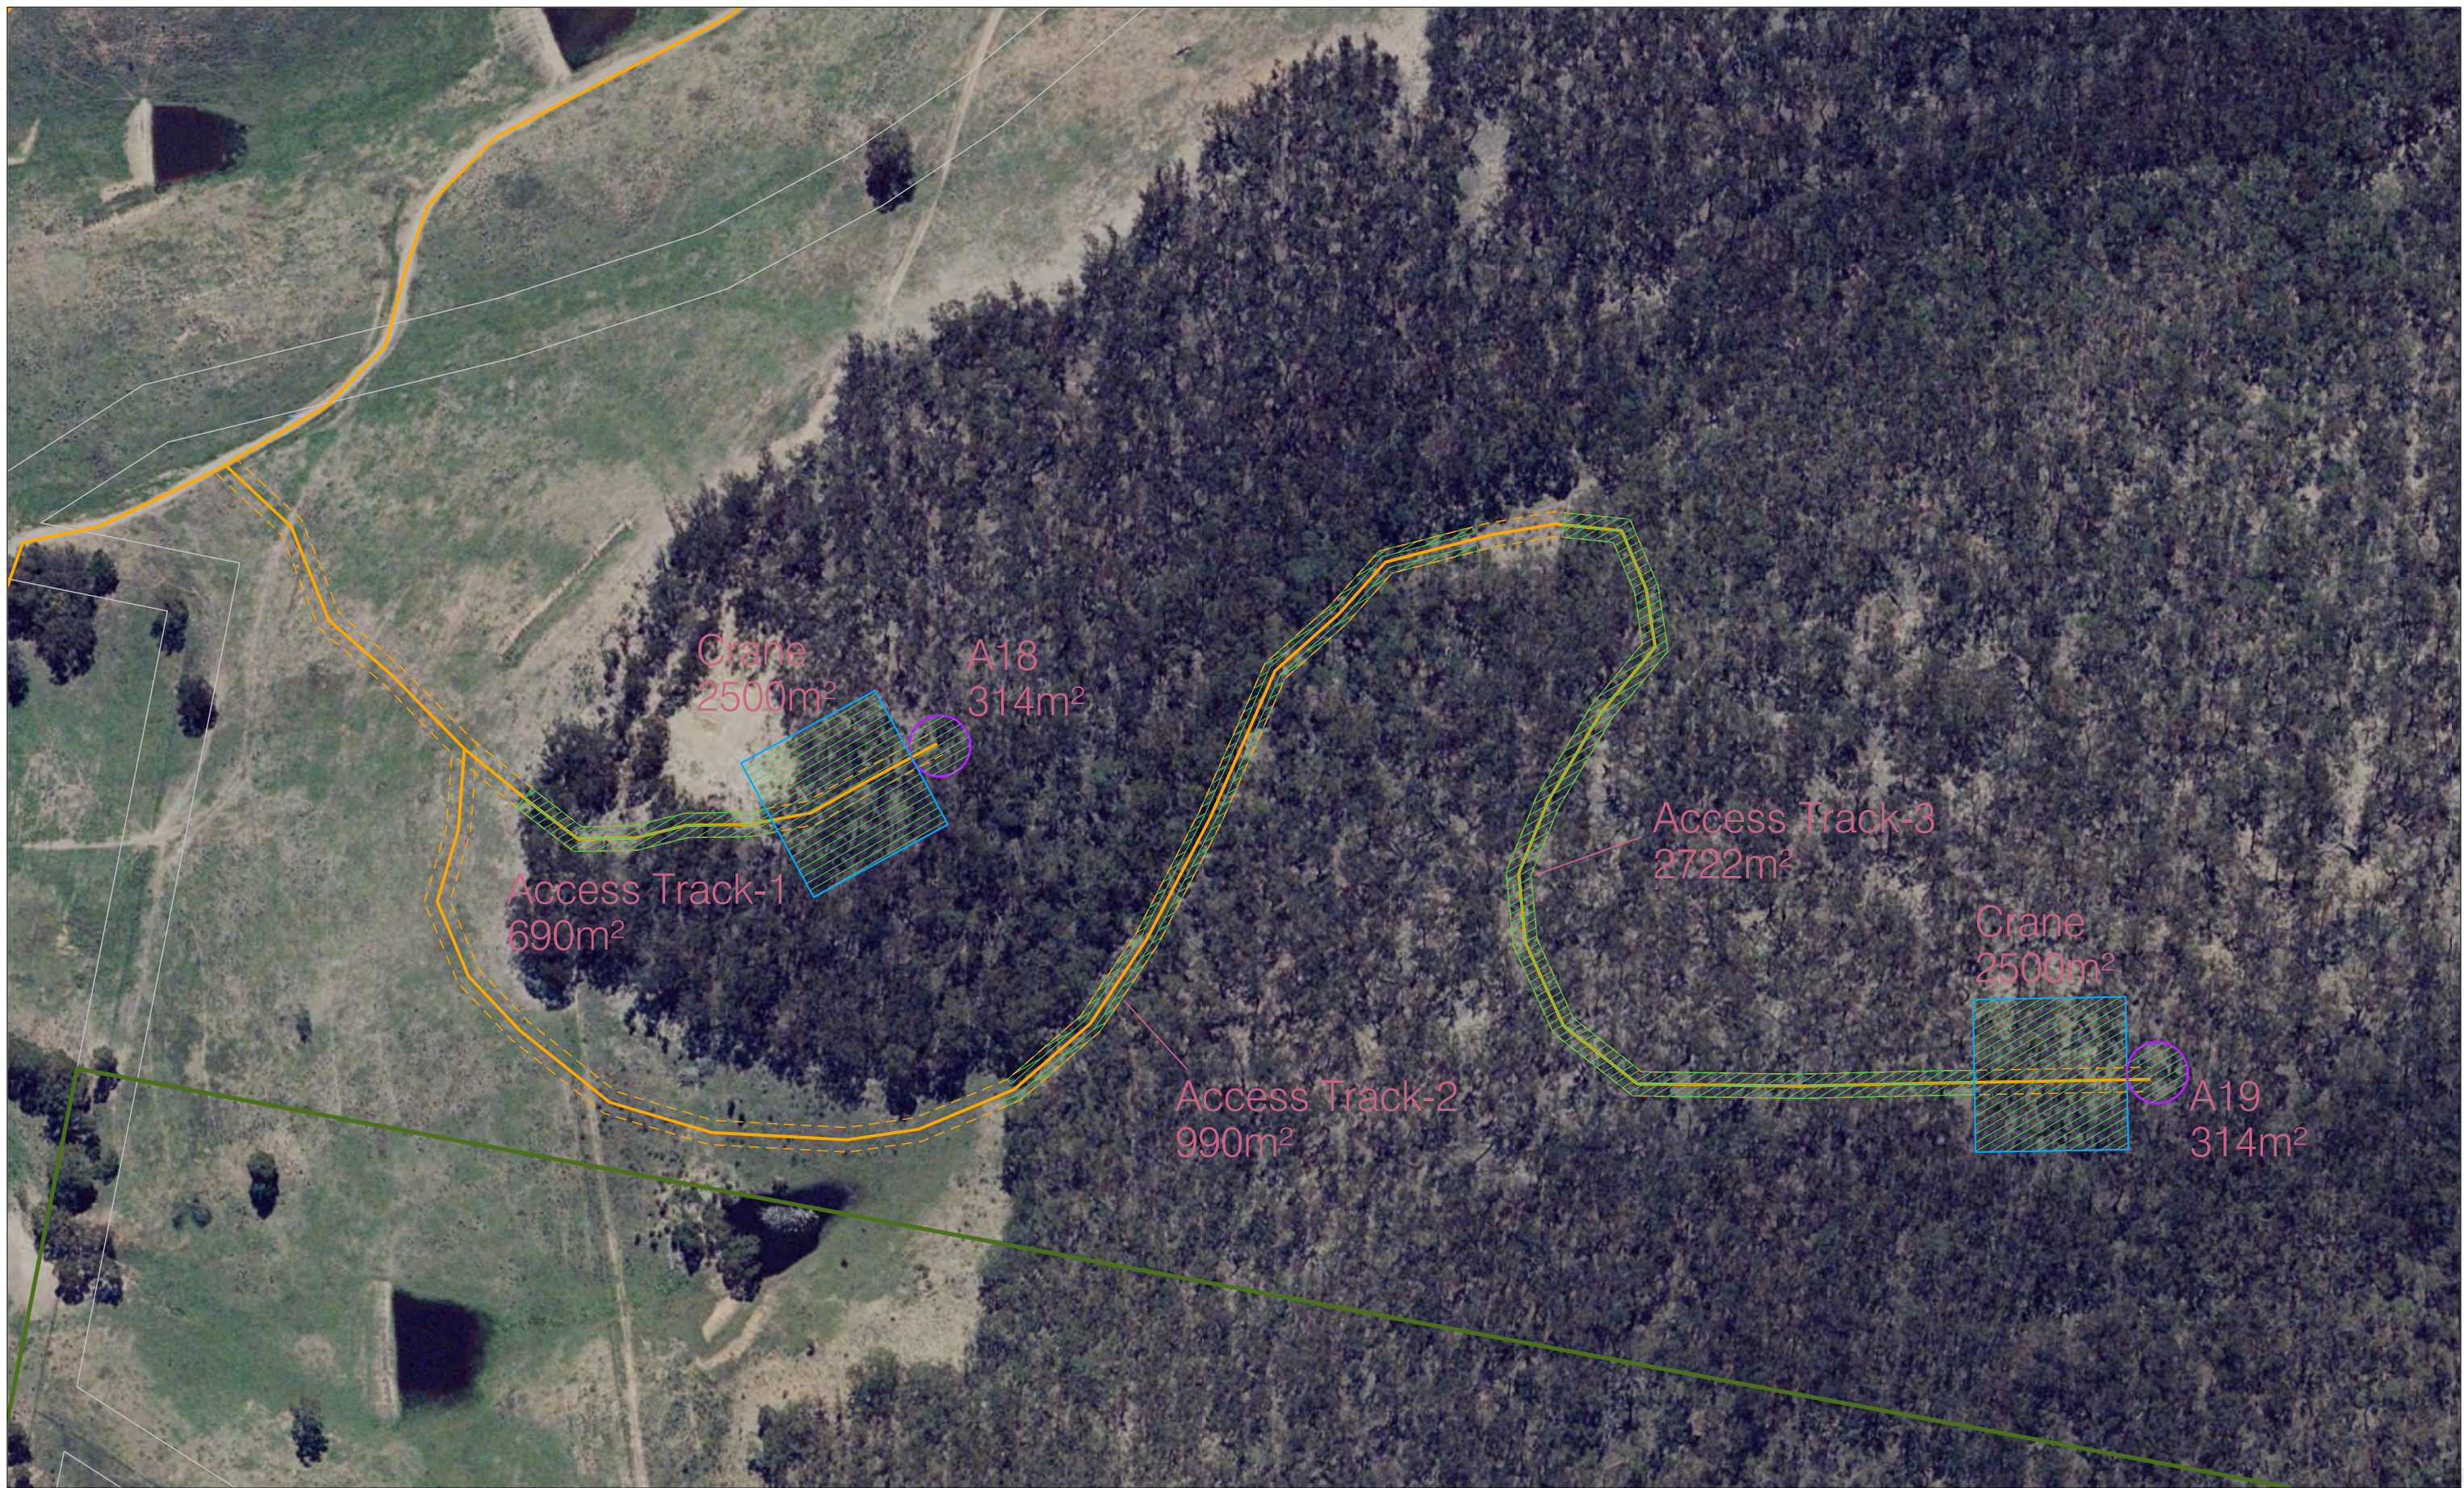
VEGETATION REMOVAL PLAN - CROOKWELL 3 EAST AREA 2
